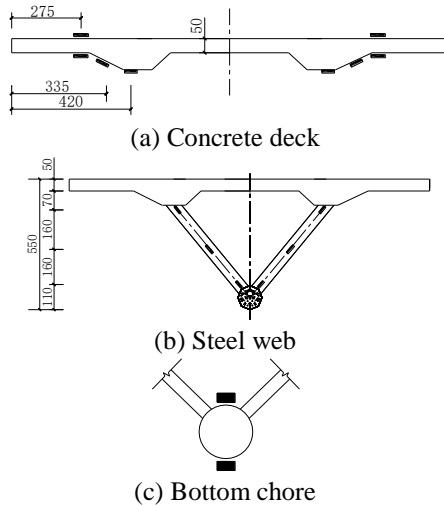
Installation of Strain gauges on the deck and the truss structure (Unit: mm)
